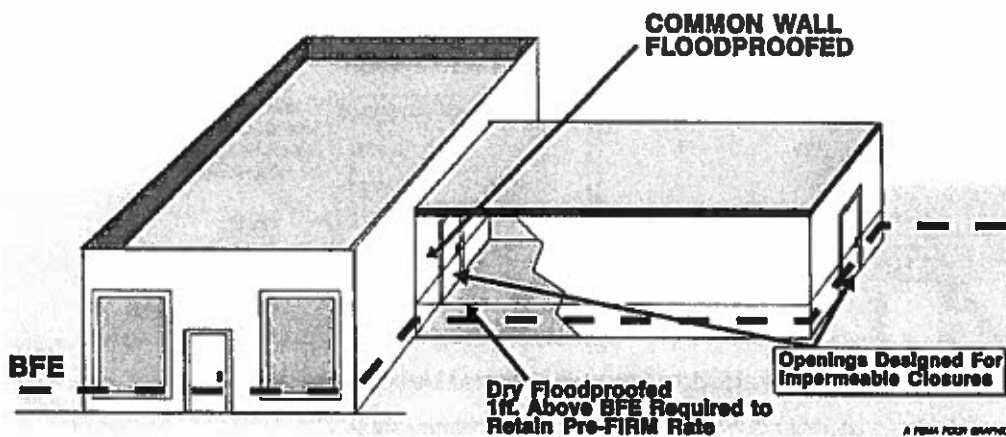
Lateral addition to a nonresidential building in an A Zone.
